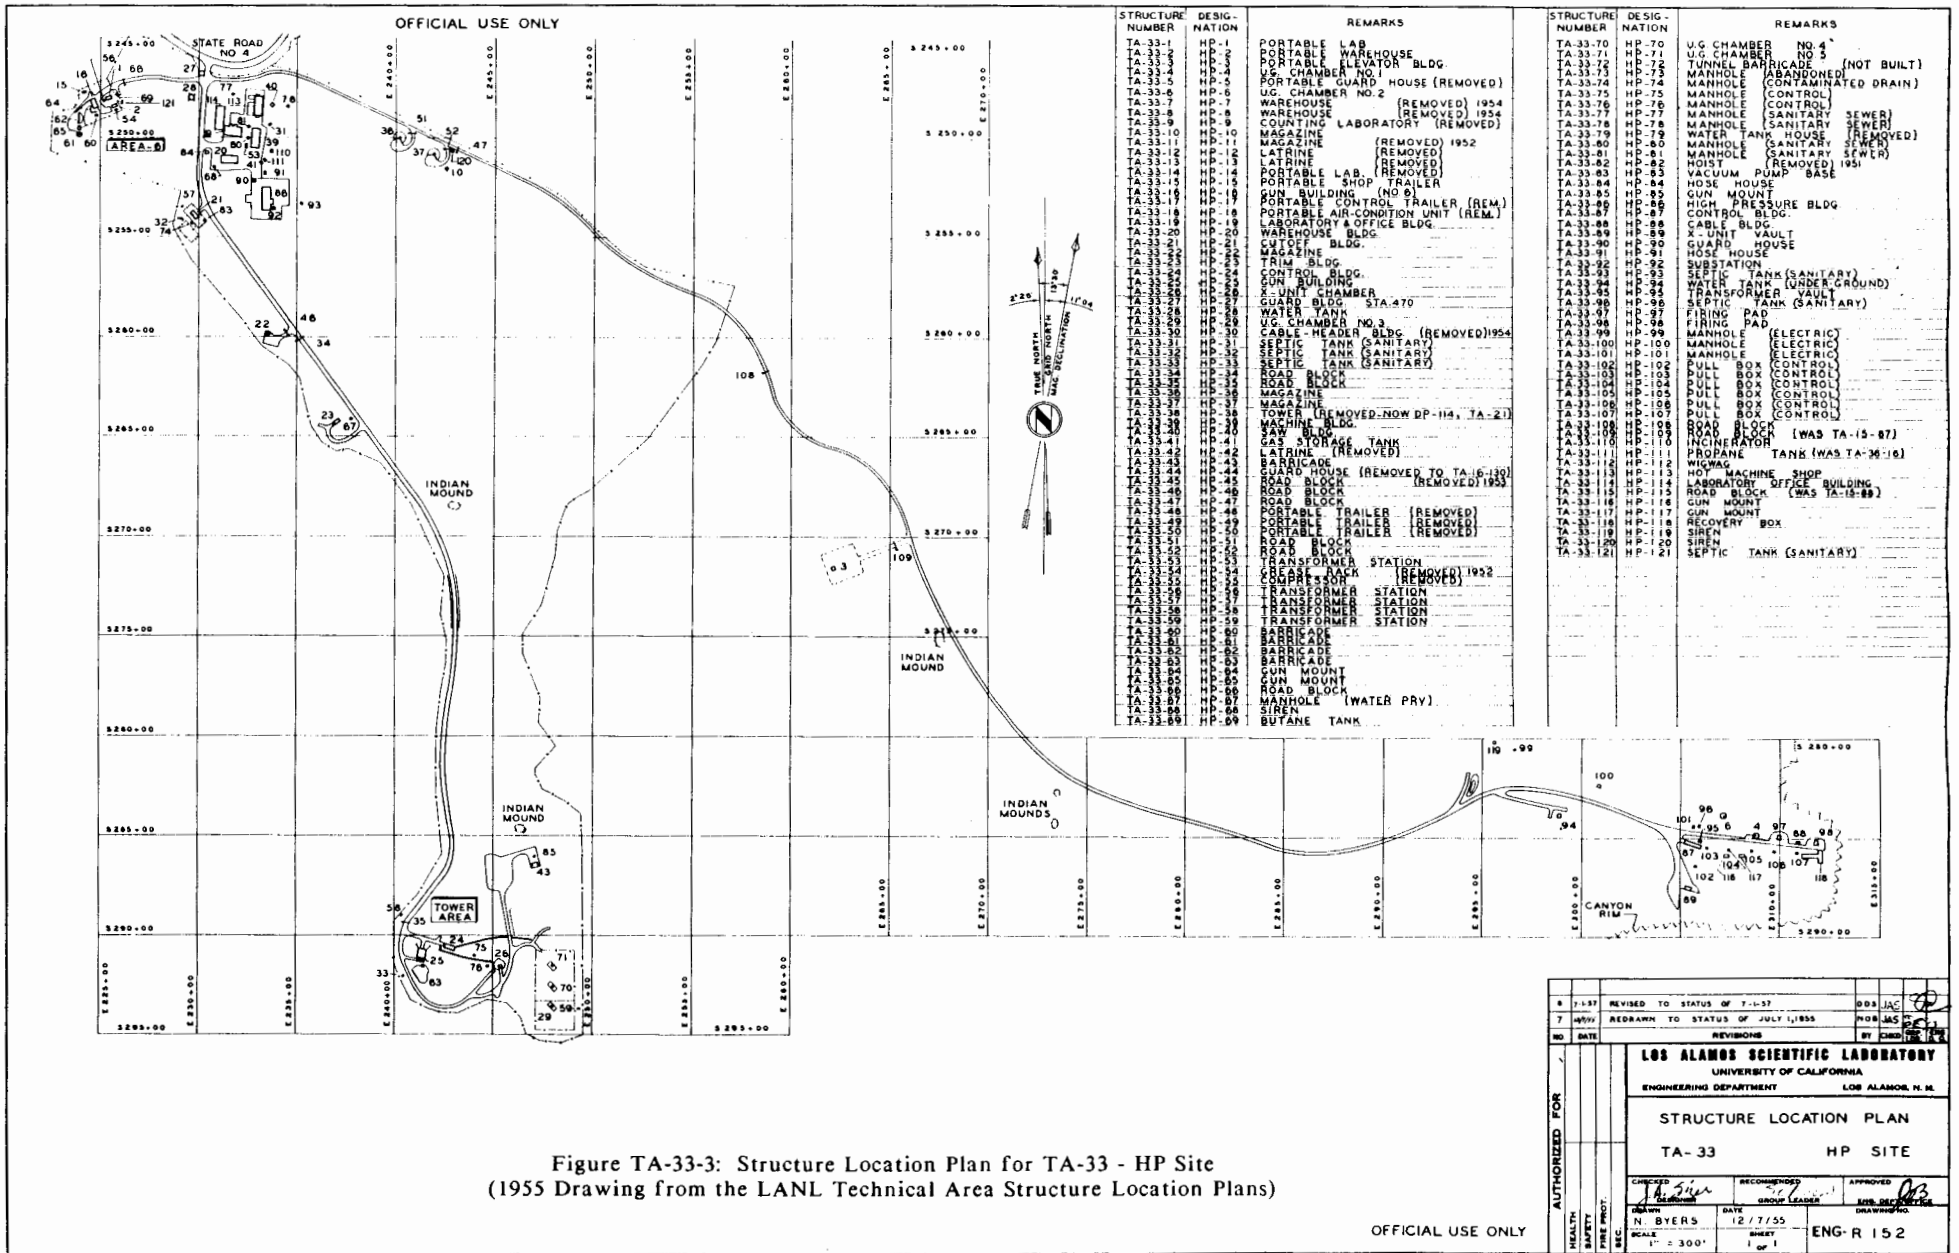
Structure Location Plan for TA-33 - HP Site (1955 Drawing from the LANL Technical Area Structure Location Plans)
